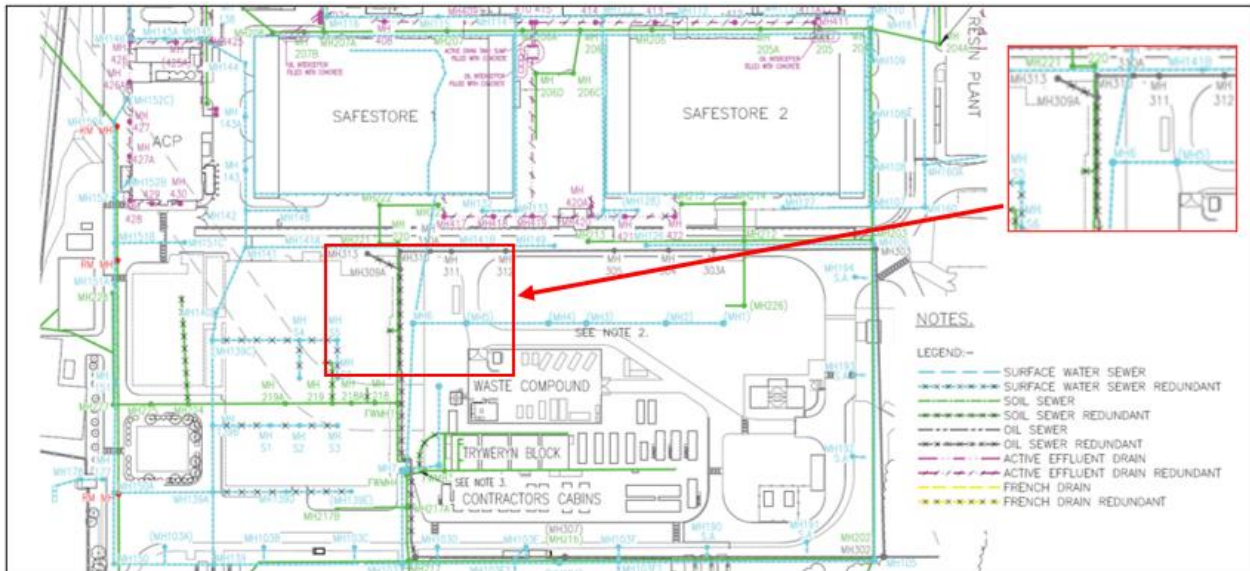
Site sewers (extract from DA/11/00/C5020) with MH6 highlighted
